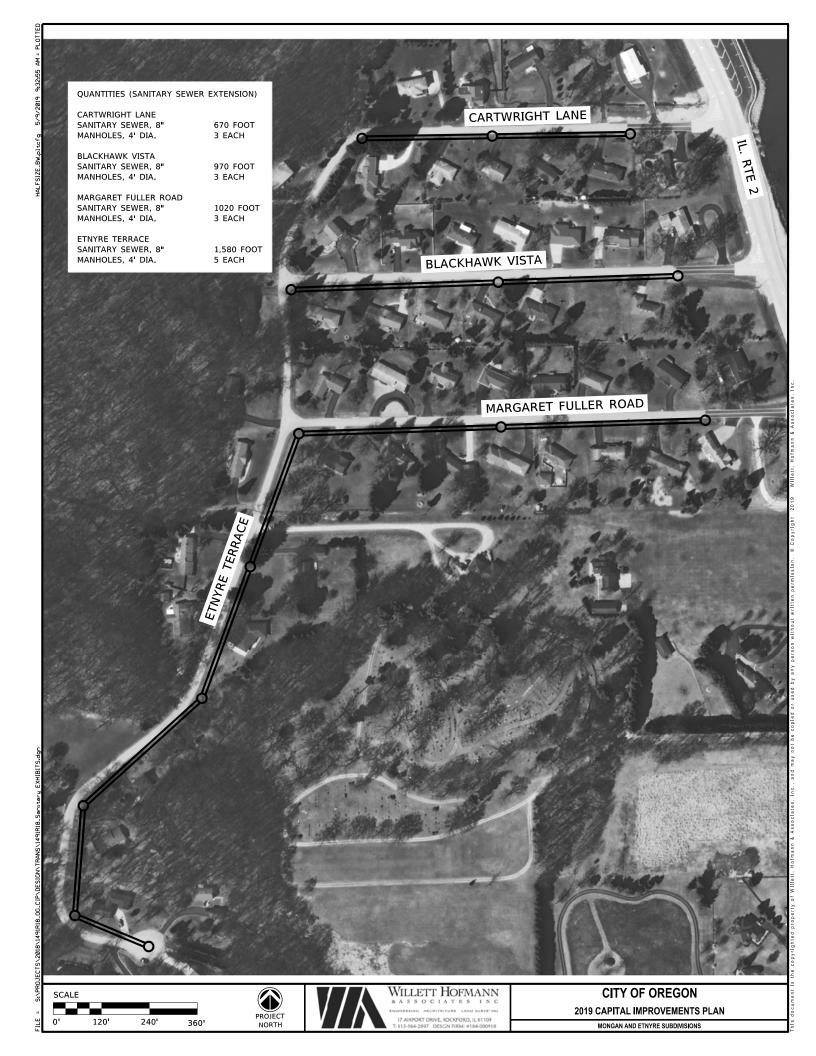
EXHIBIT C: SANITARY SEWER COLLECTION SYSTEM AND WASTEWATER TREATMENT PLAN
